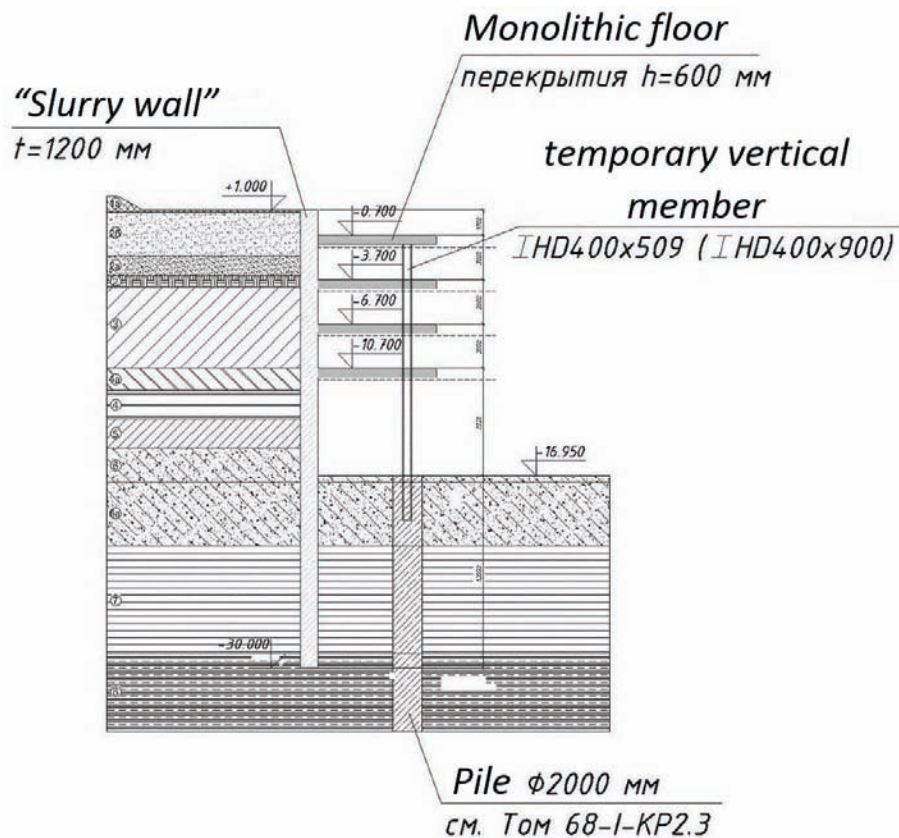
Section of the structure of the foundation pit fence for building of the tower.
